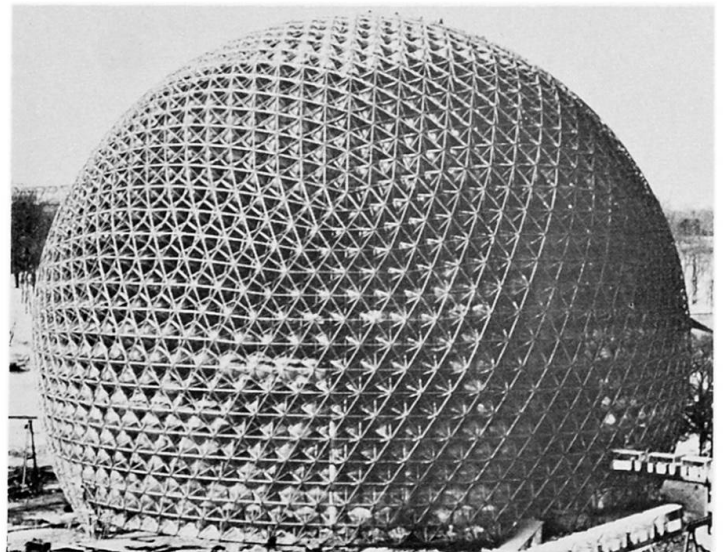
Geodesic steel dome erected for the American Pavilion at Expo '67
